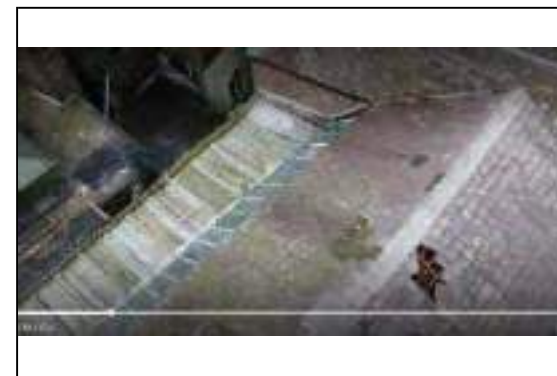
Lecture theatre roof failure (drone footage).
